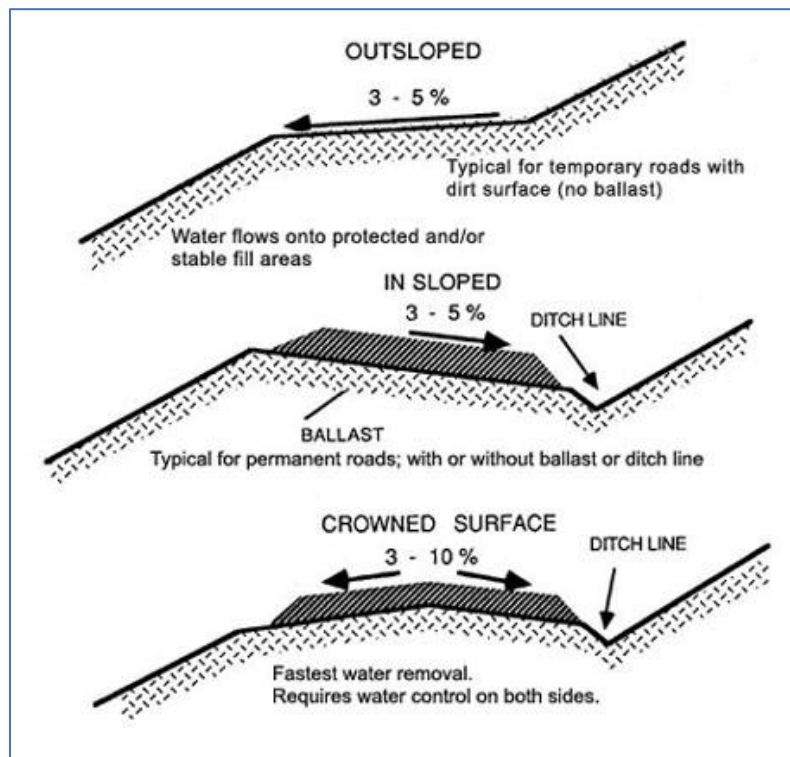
Road construction grading patterns used to control surface drainage
